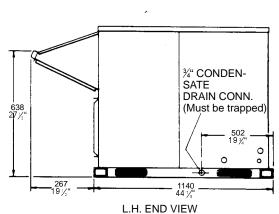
DIMENSIONS & CLEARANCES (continued)
